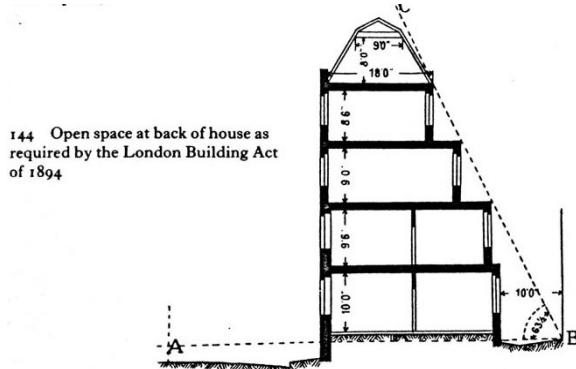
Open space at back of townhouse as required by the London Building Act of 1894.
